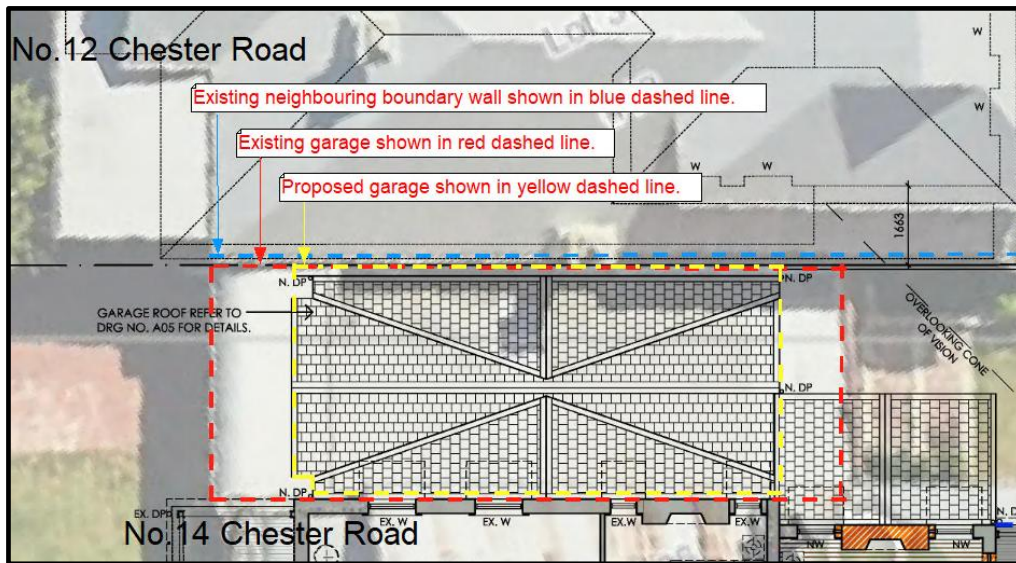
Comparison of Existing and Proposed Garage Boundary Wall Length
